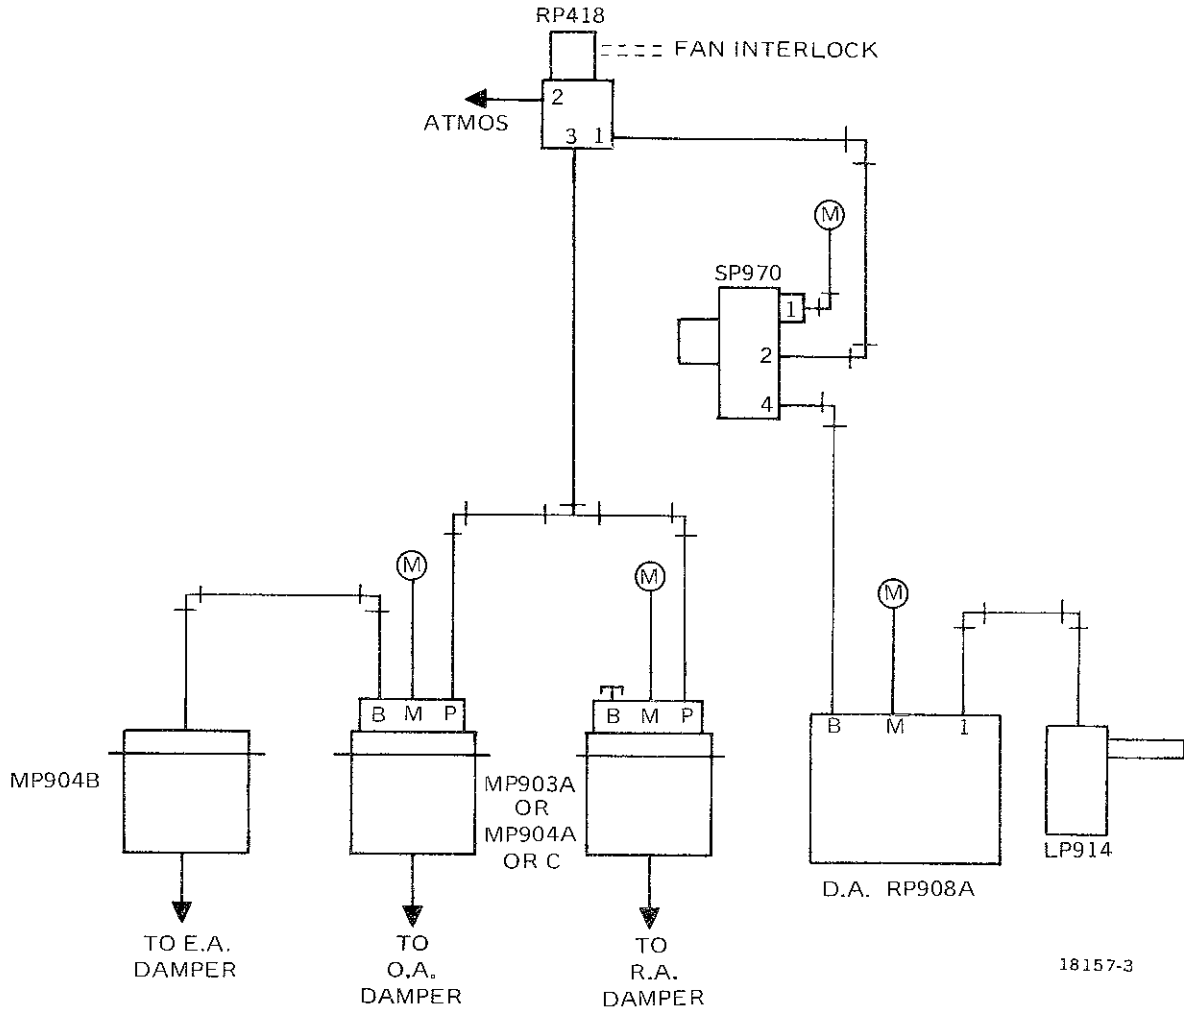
MP904 Used with Mixed Air Controller to Control Outdoor, Return, and Exhaust Air Dampers.
